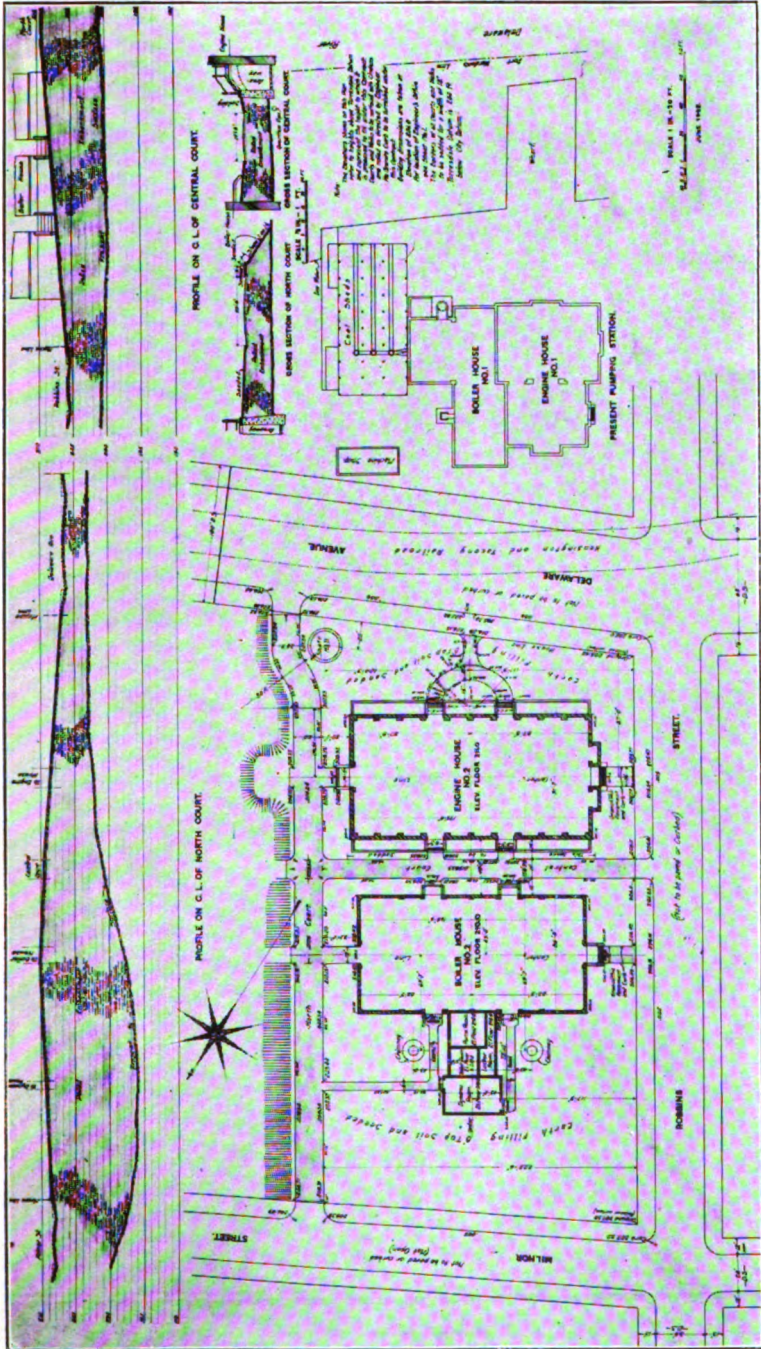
LARDNER'S POINT PUMPING STATION—PLAN OF BUILDINGS AND COURTS.
